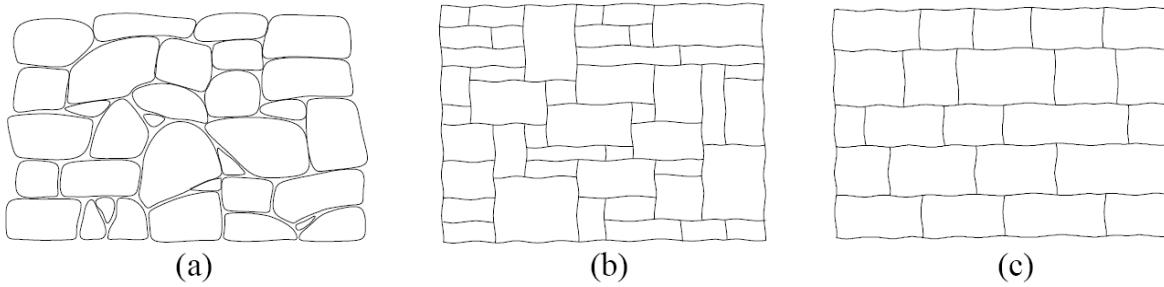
The possible arrangement for stone masonry: (a) rubble masonry; (b) ashlar masonry; (c) coursed ashlar masonry (Lourenço et al., 1998).
